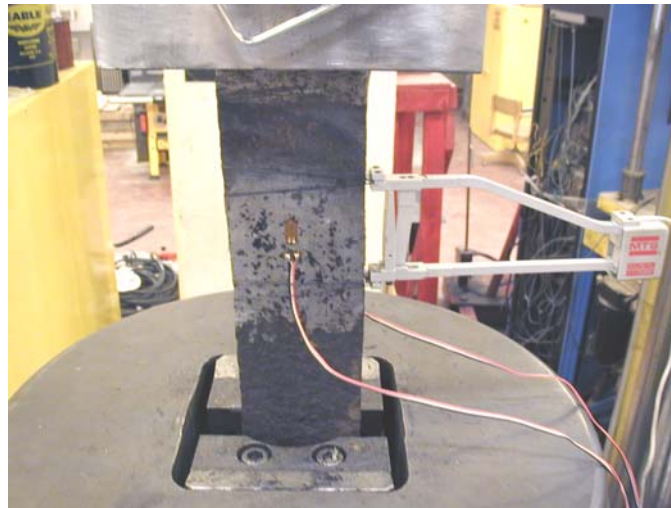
Shank of Eyebar End Connection Placed in Bottom Grip of MTS Machine
